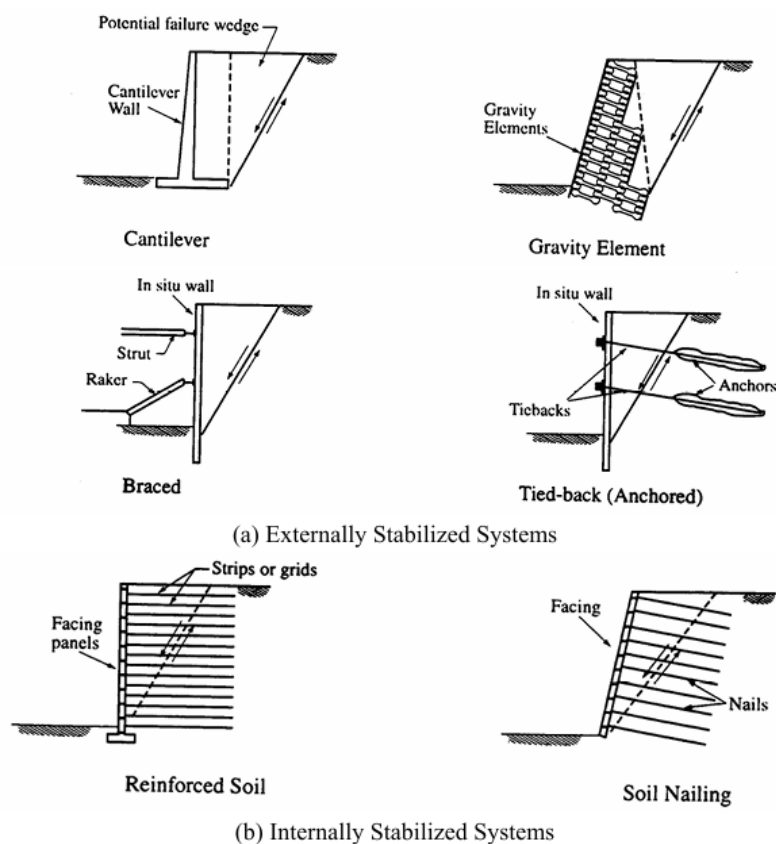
Variety of retaining walls (after O'Rourke and Jones, 1990)
